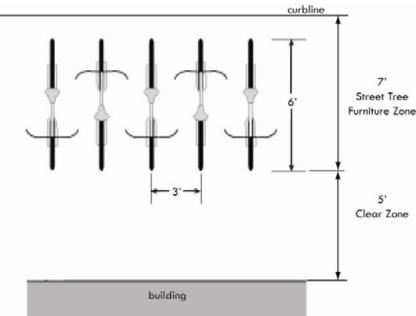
Bicycle parking design – Pedestrian Priority Street sidewalk
